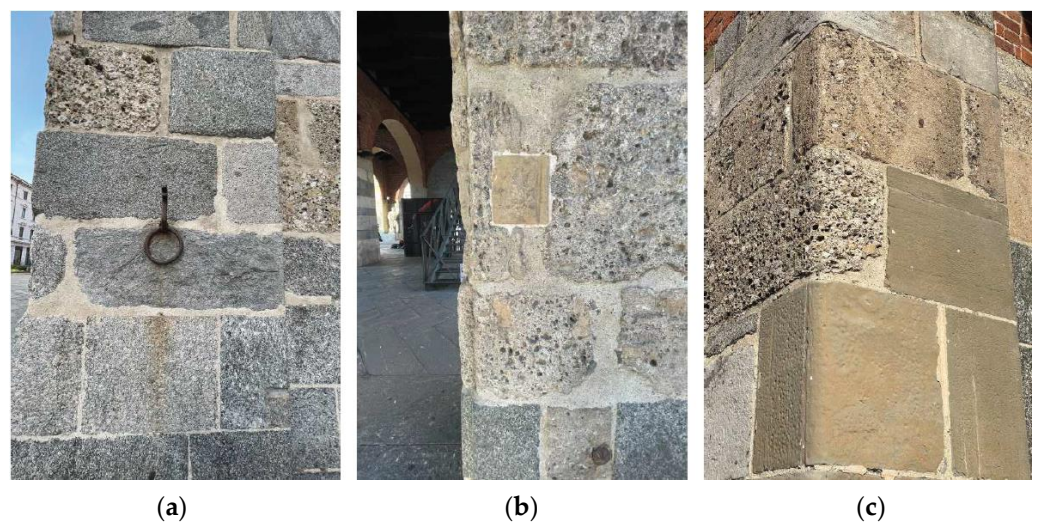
The masonry of the perimetrical columns appears to be composed of different stone blocks, such as Gneiss, Ceppo (i.e., a local soft and porous sandstone), and soft sandstone. (a) Detail of stone masonry column mainly composed of Serizzo; (b) mainly in Ceppo and (c) column mainly in Ceppo and sandstone.
